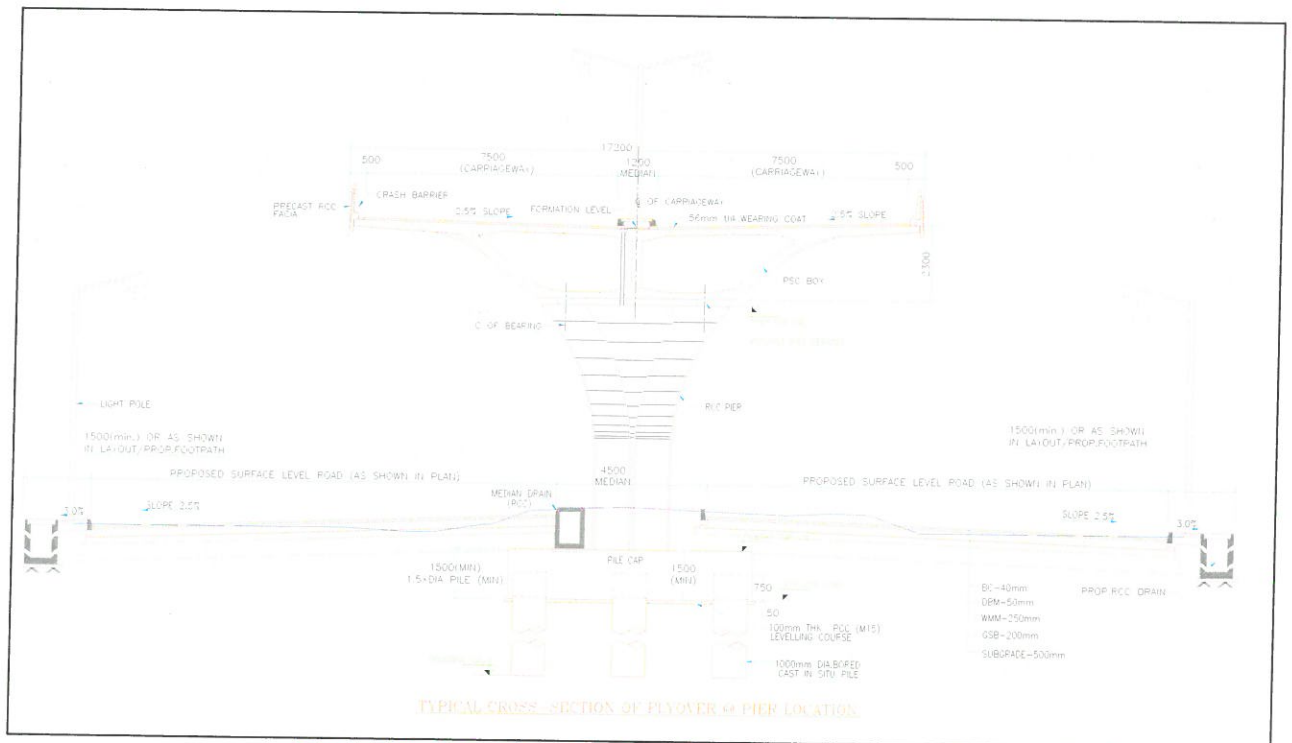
Typical Cross Section of Flyover, Pier Location
